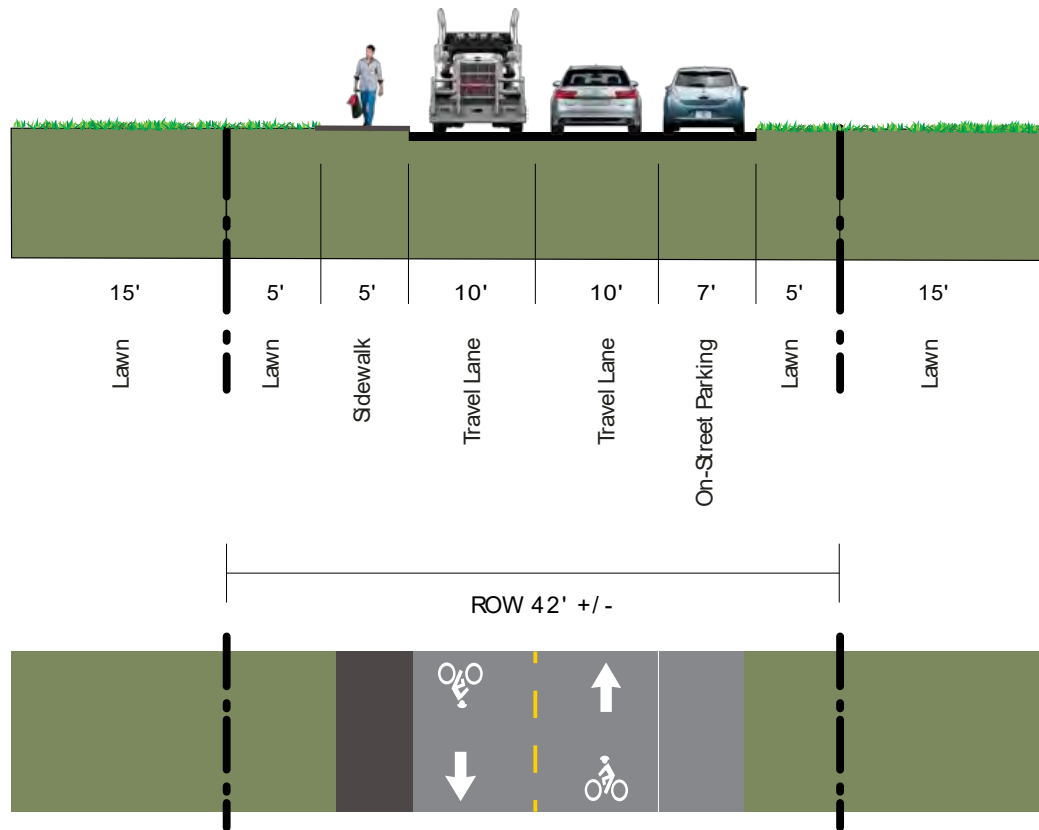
Government Street Proposed Cross Section (two-way-segment)
